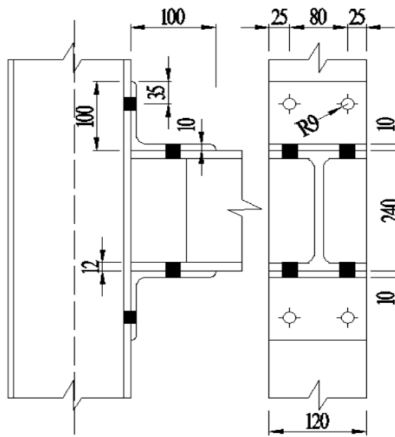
Details of bolted stainless-steel beam-to-column joint [6]
